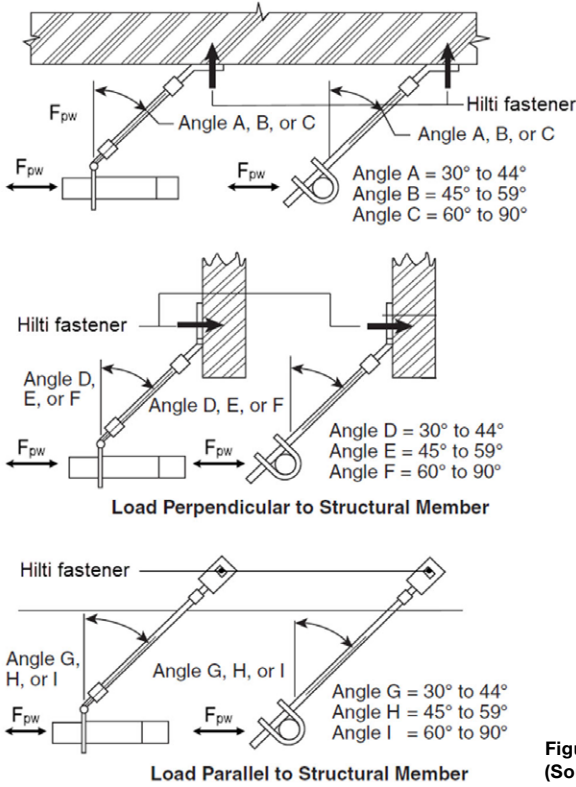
Sway brace load, F_{pw} , from typical sway brace configuration
